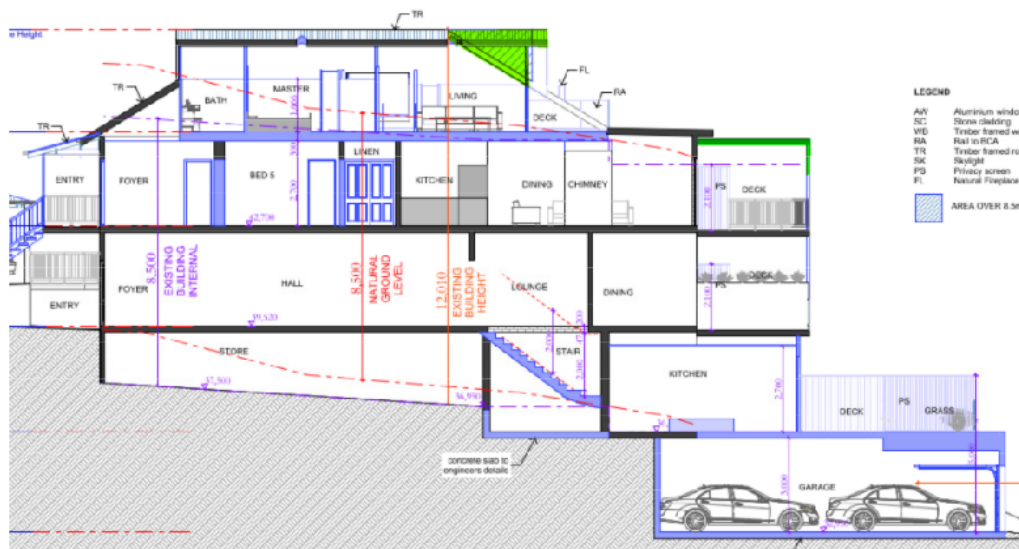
Shows the additional building height and built form of the proposed works (coloured in green).
